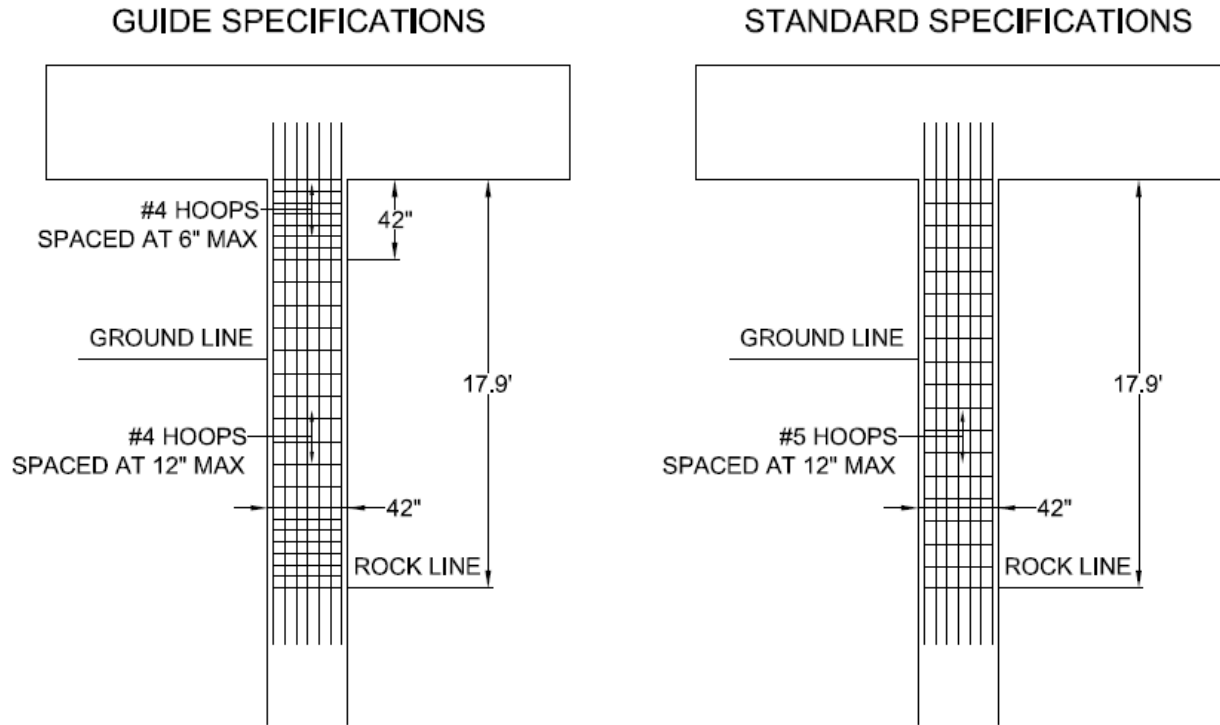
Oseligee Creek Bridge Bent 2 Final Design Details (SDC A2)
